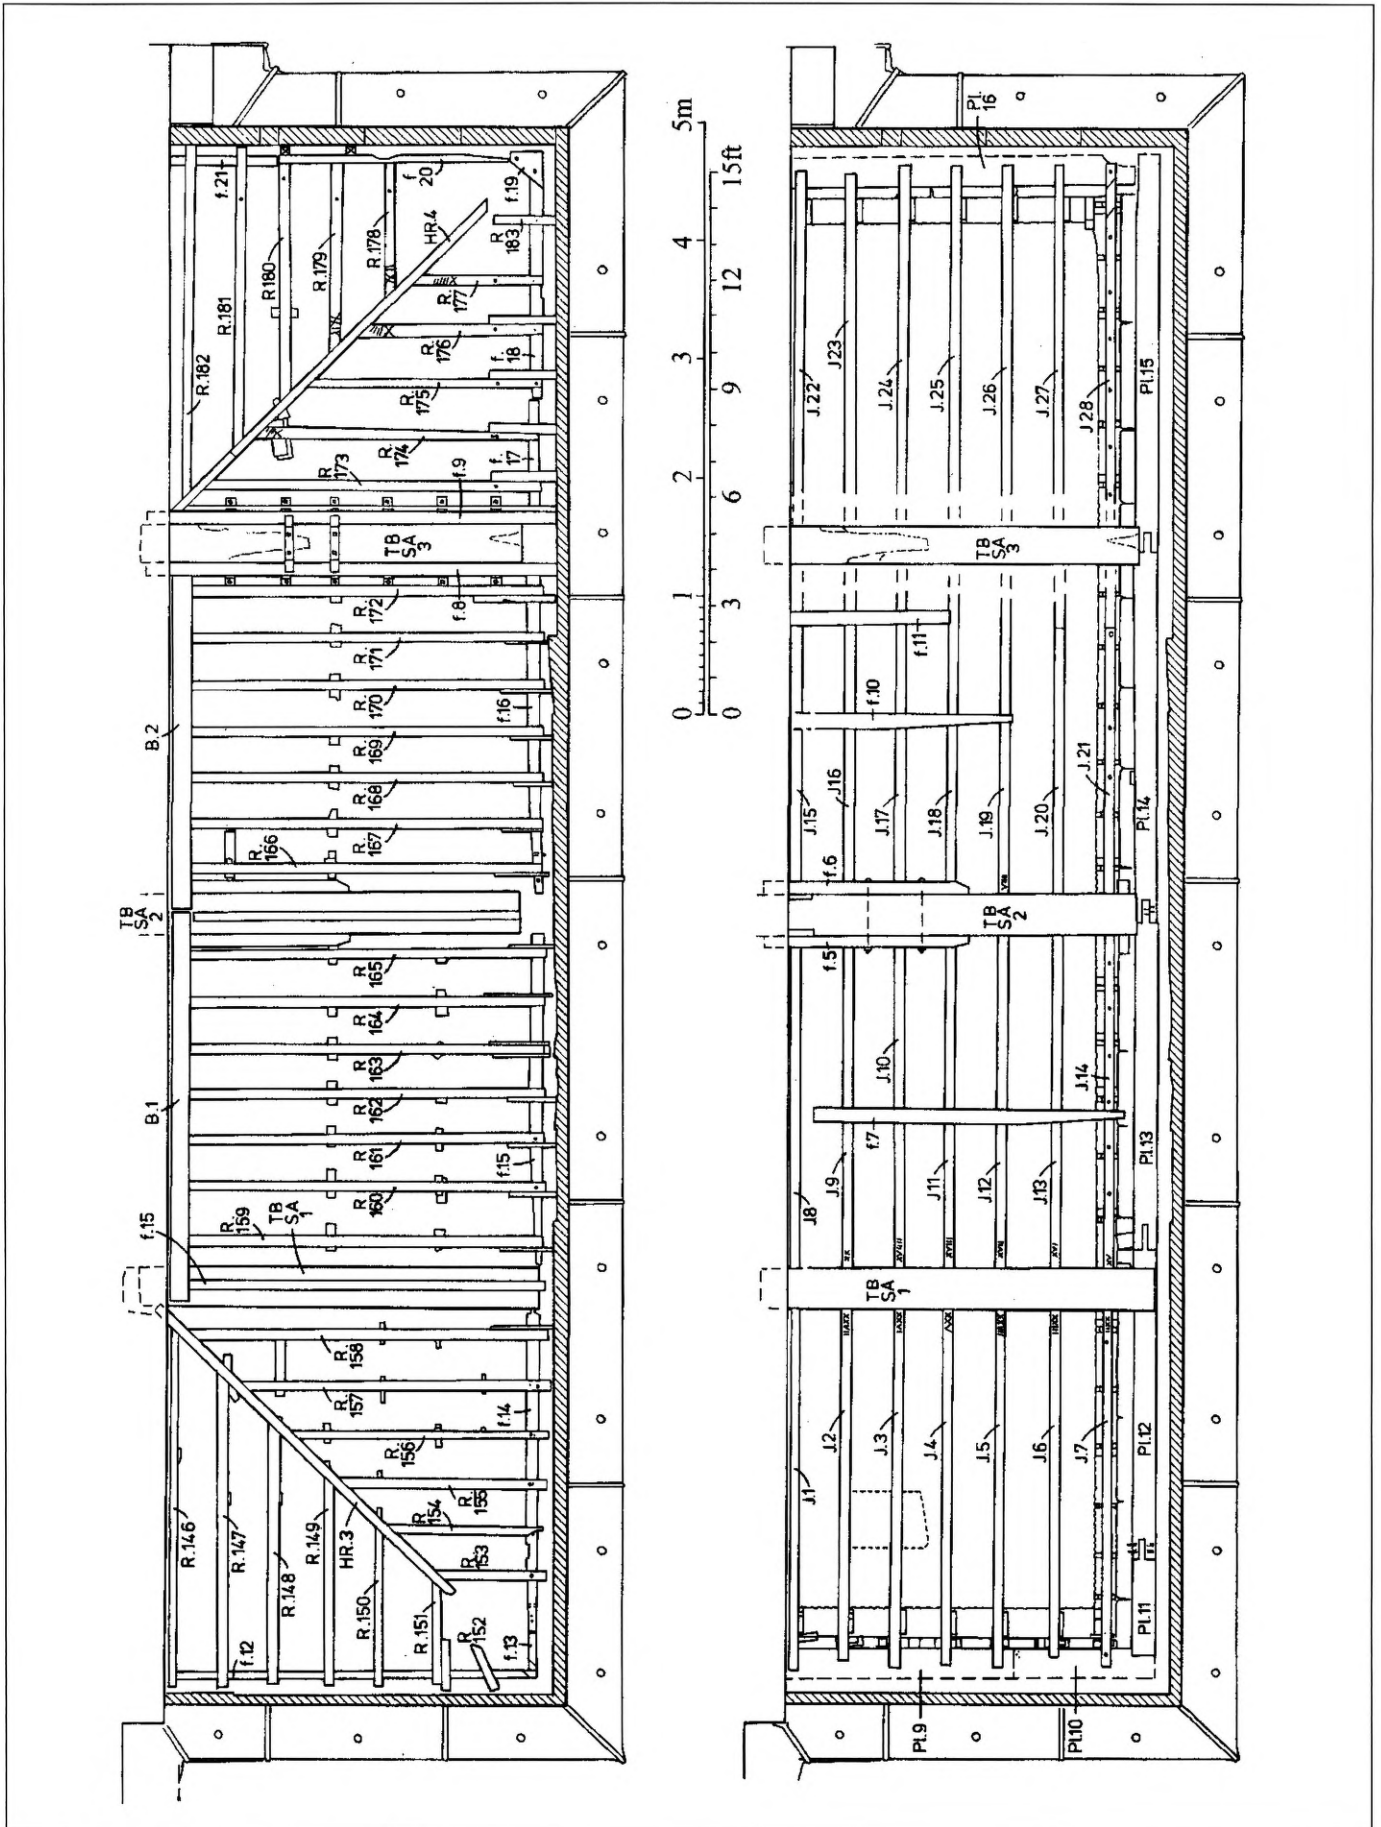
South aisle roof. Left, rafters; right, ceiling joists.
